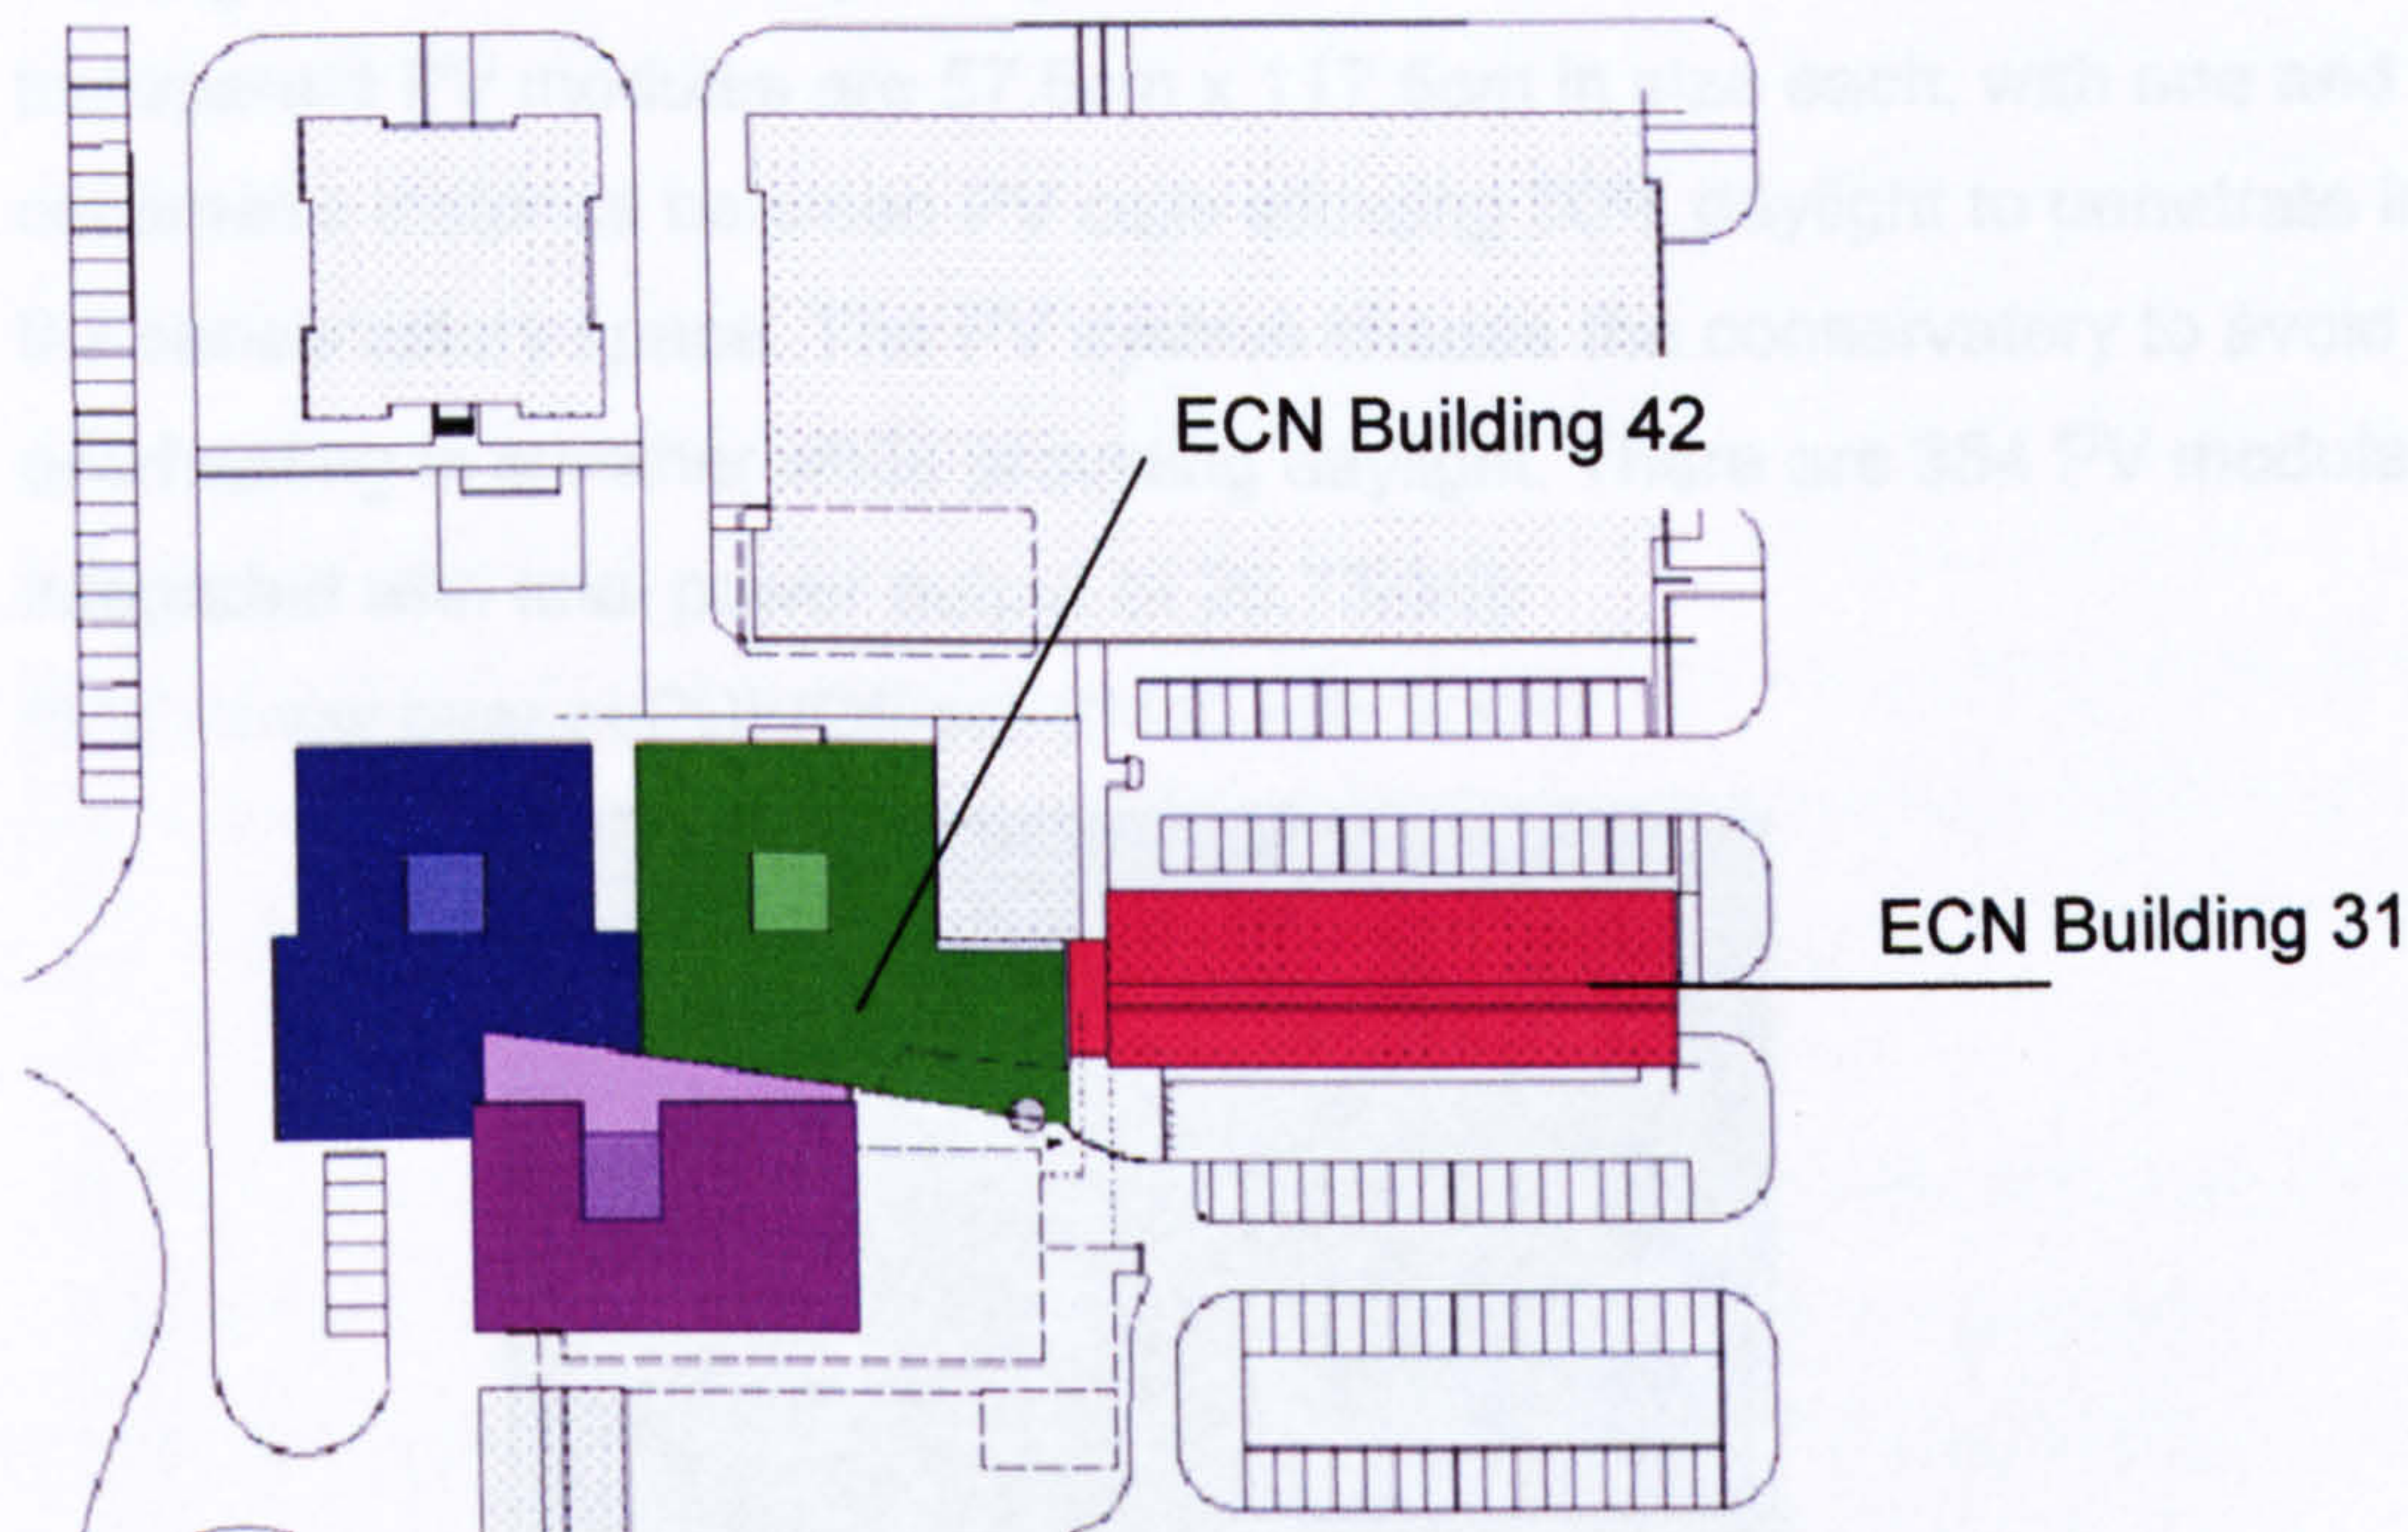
ECN 42 building, Petten, the Netherlands. Site plan [western and southern blocks not yet built].
